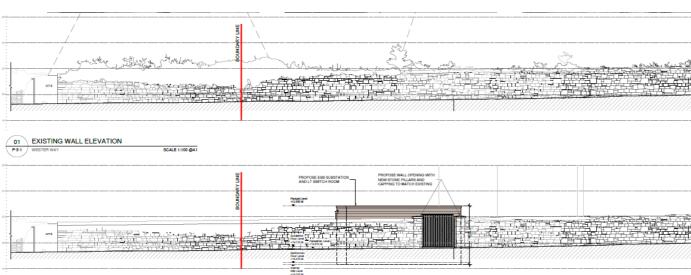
Extract showing proposed gate access treatment to the ESB Substation from Western Way
